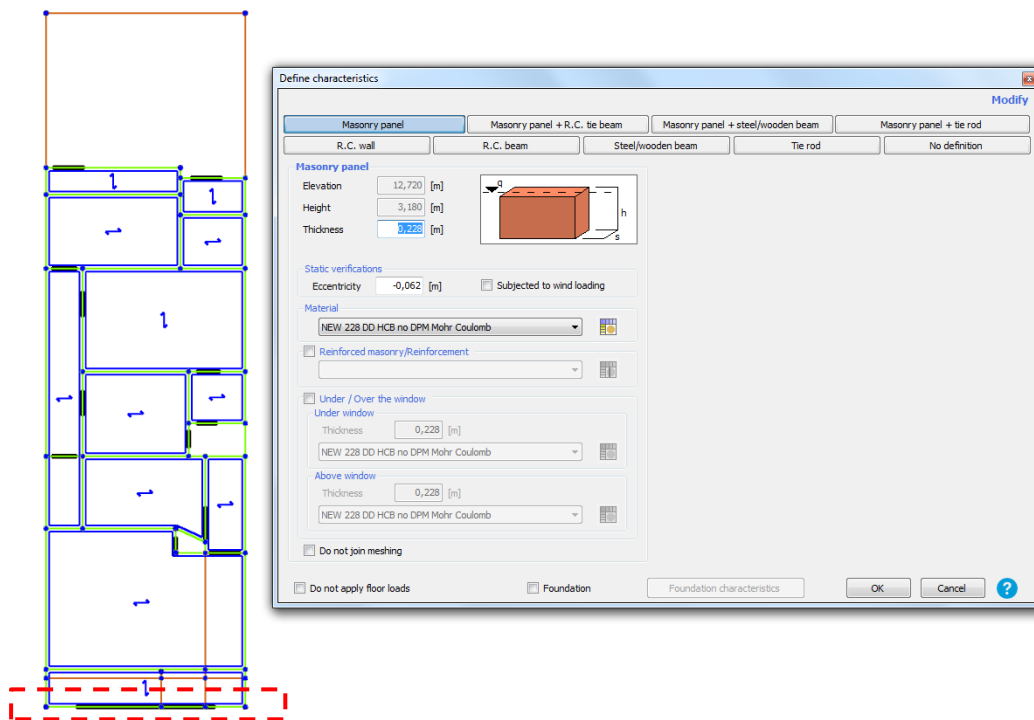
Front facade modelled as a single 228 mm thick hollow concrete blockwork wall positioned along the centreline of the external leaf of the double leaf wall and loading from slab defined at an eccentricity: typical floor plan and masonry wall settings in 3Muri®.
